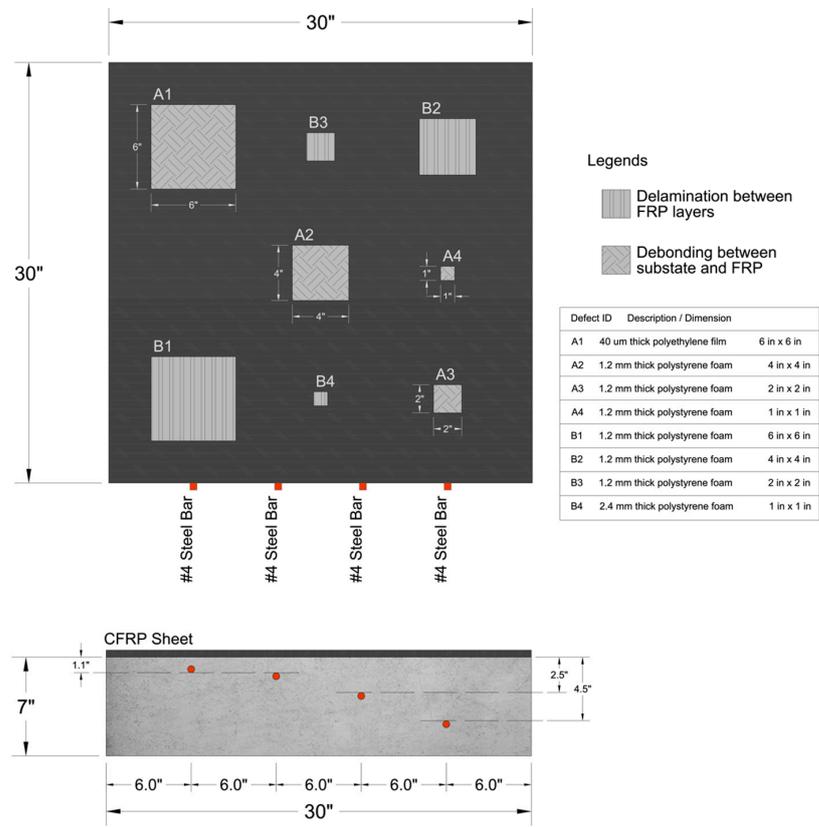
Slab M', specimen with steel rebars and damage in the EB-FRP system. 1 in. = 25.4 mm.
